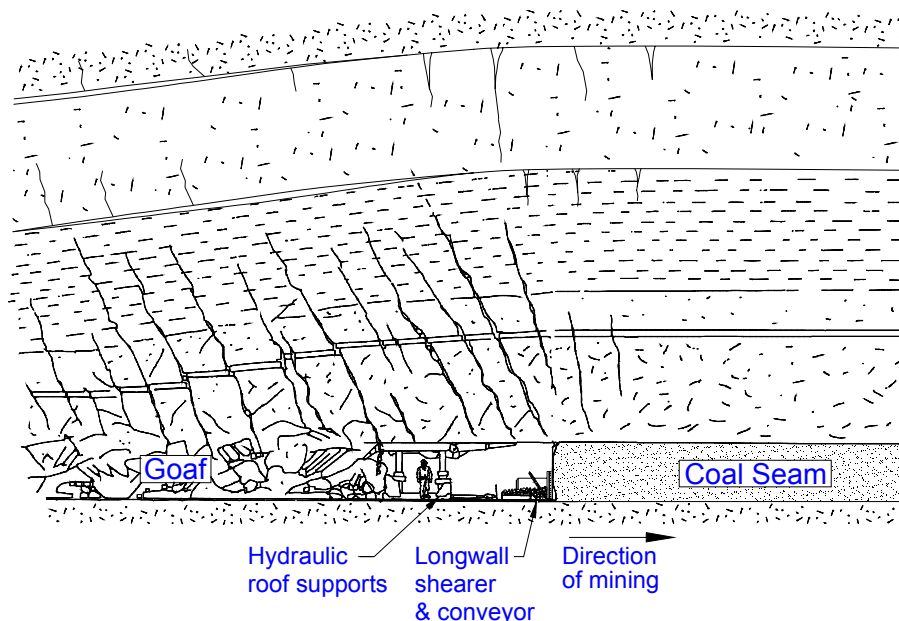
Cross-section along the Length of a Typical Longwall at the Coal Face
